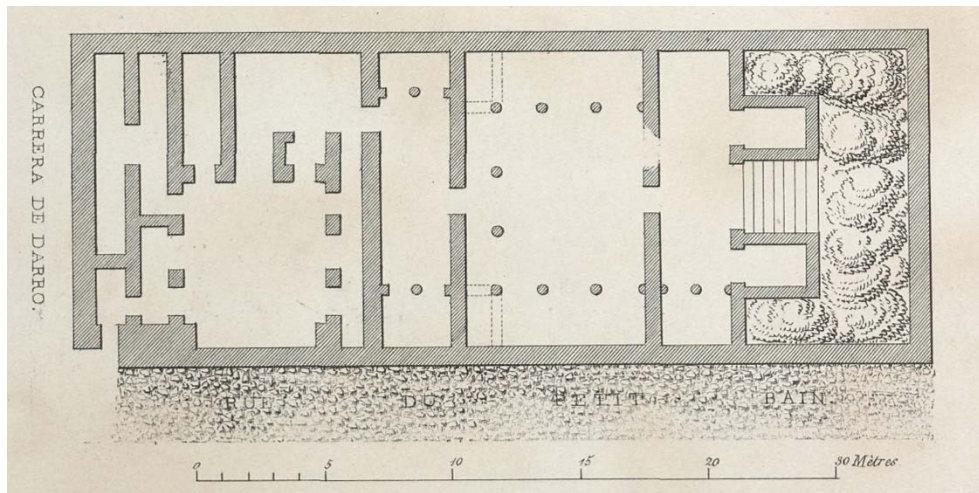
Ground plan of El Bañuelo (after J.-Ph. Girault de Prangey, 1837).
